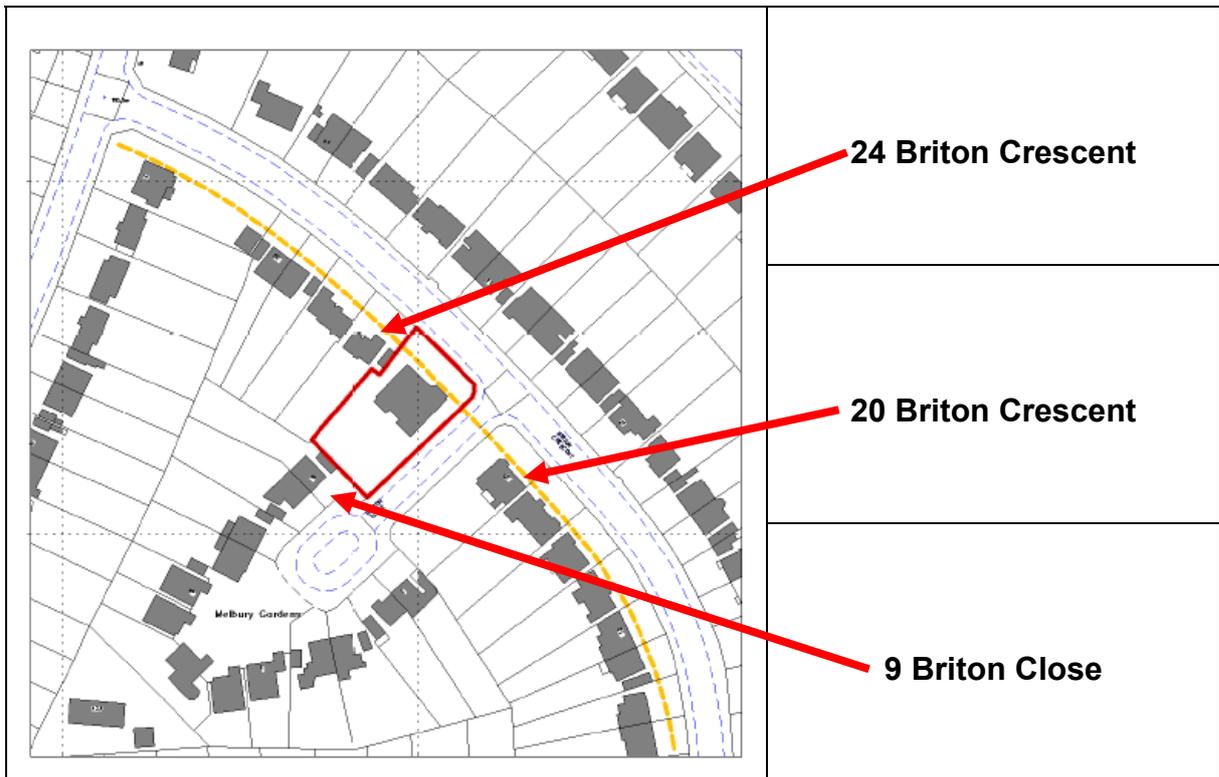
Ground floor plan highlighting the relationship with the adjoining occupiers.
